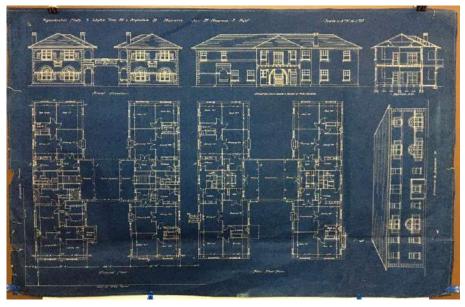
Architectural drawings for residential flats at the corner of Wattletree Road and Drysdale Street for Dr F Magnus Kiel, 1928 (SHC MB4598)
